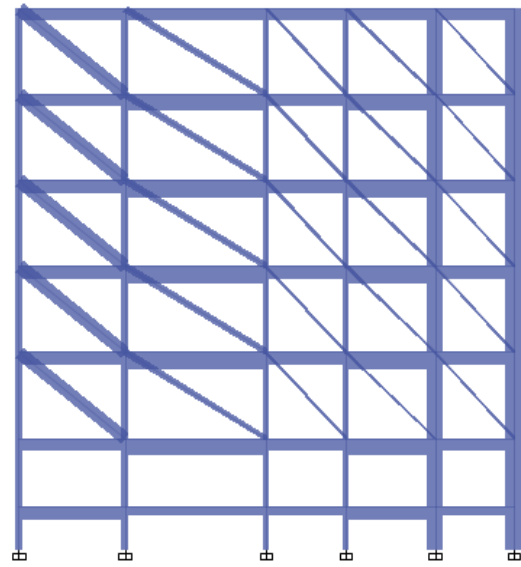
(e). Model 5, RC frame replaced by equivalent strut for openings in infill wall.
